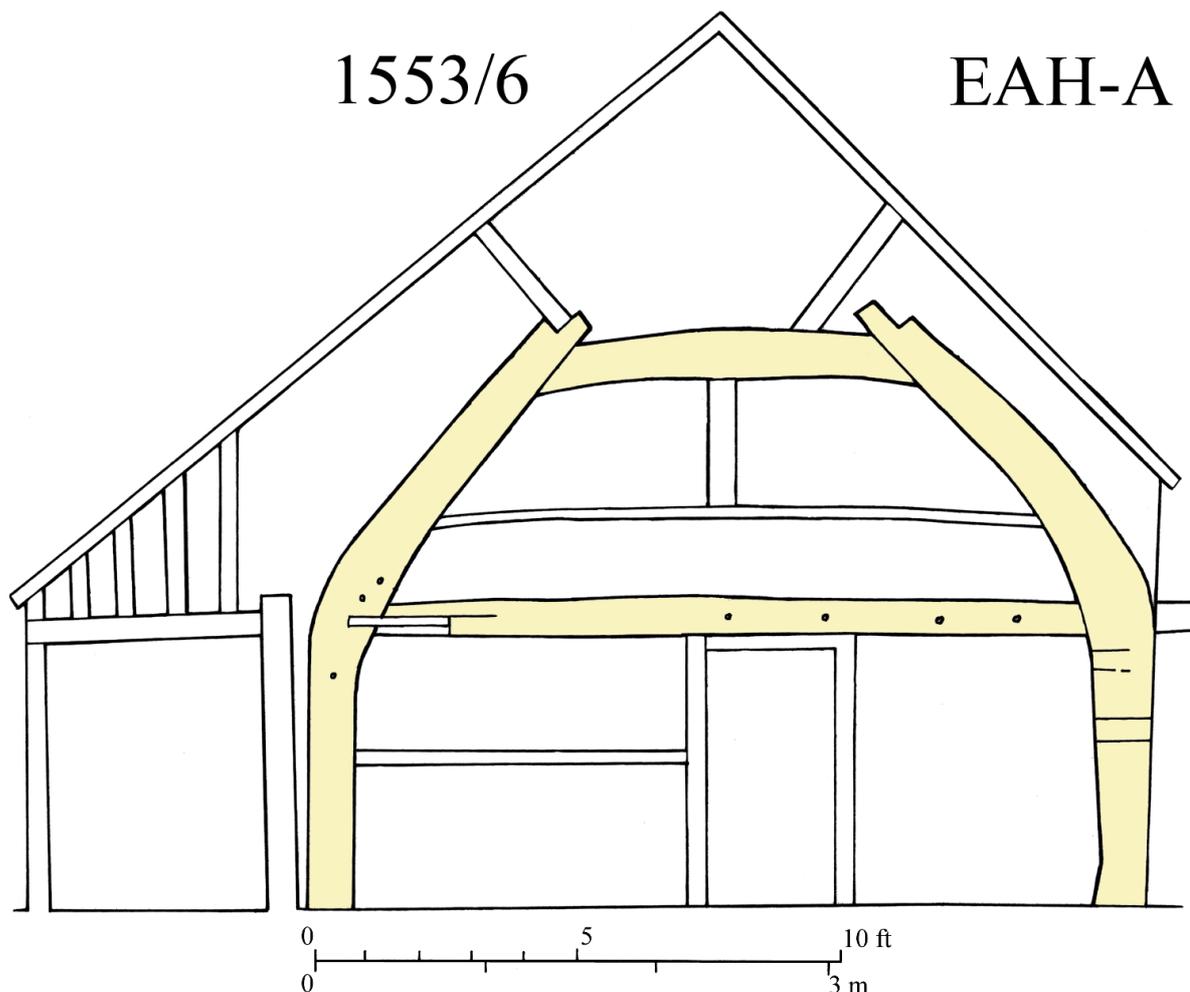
Section of truss T2 (redrawn from Steane (1985)).
